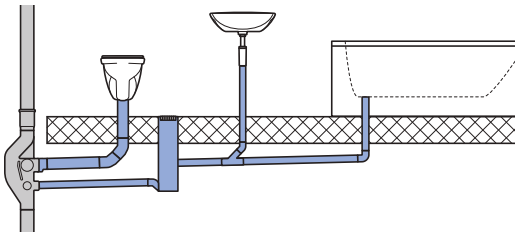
Structure with single branch discharge pipe and collector branch discharge pipe with floor drain under the ceiling
